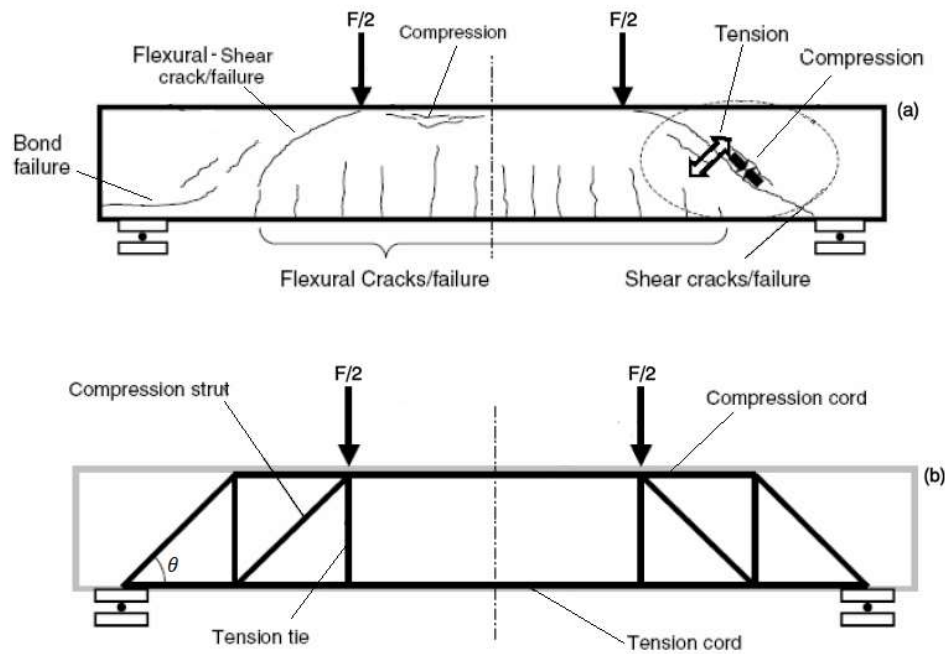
shows the shear force transfer through a reinforced concrete section (MacGregor and Wright, 2005). The mechanism of shear failure in reinforced concrete beams is affected by many factors such as the ratio of shear steel reinforcement, the longitudinal tension steel reinforcement ratio, concrete strength, shear span ratio, type and size of the aggregates and the geometry of the beam cross section (Sas, 2011). The total shear capacity of reinforced concrete section can be calculated from the following equation:
